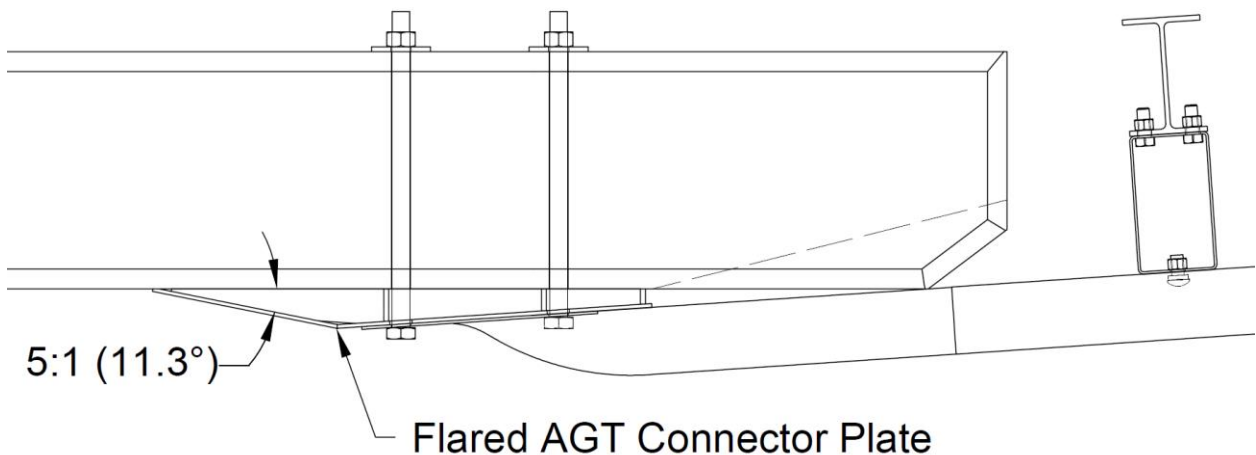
Option 3 – Angled Connector Plate Assembly, Enlarged
